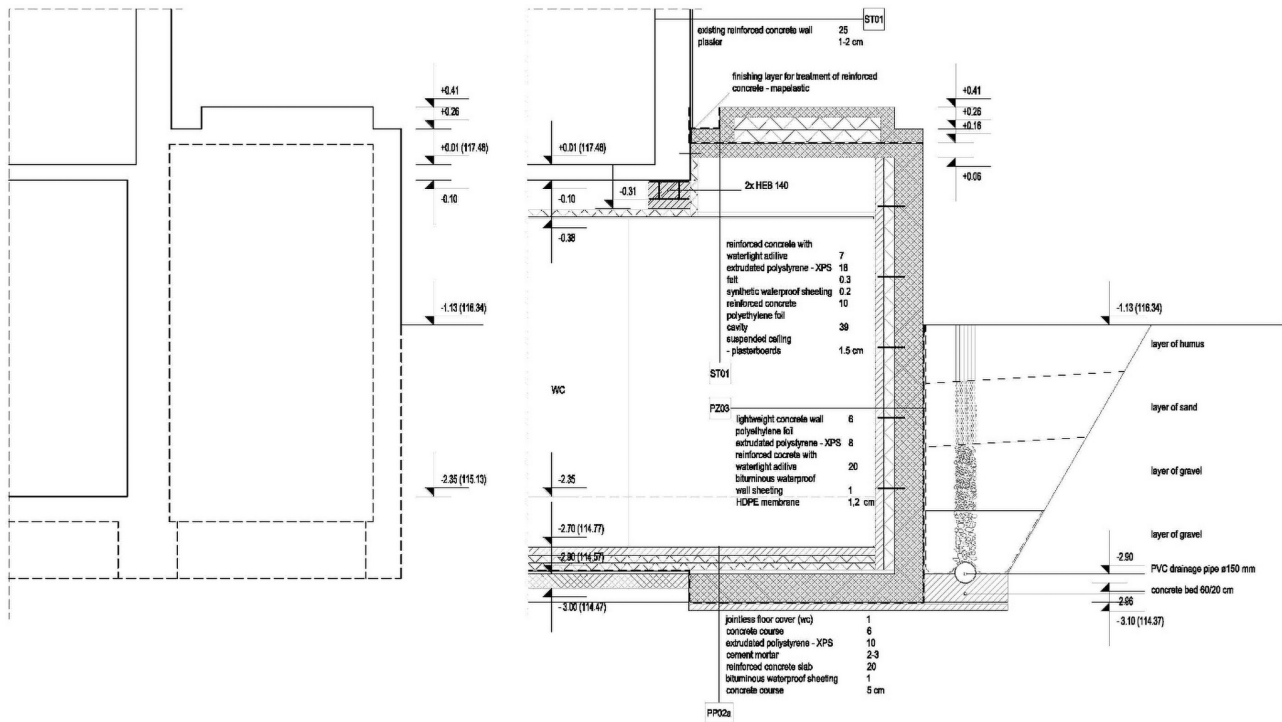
Longitudinal section through one of the reconstructed basement segments showing the outer walls insulated on the inner side, partially insulated roof slab and new drainage layers.
